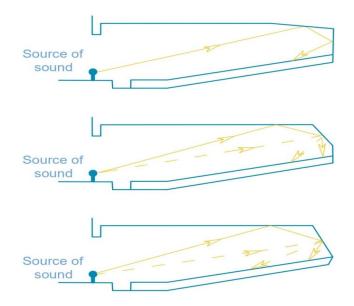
Rational types of abutment of the ceiling to the rear wall
